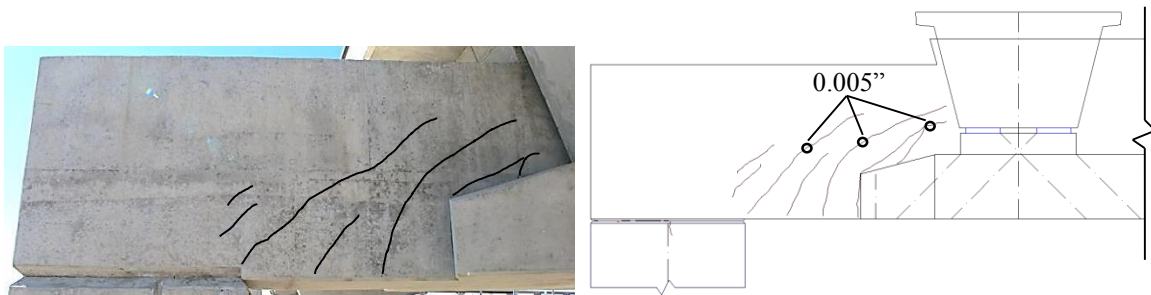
Crack Size and Location on the Southwest Corner of Waco Bent 19
